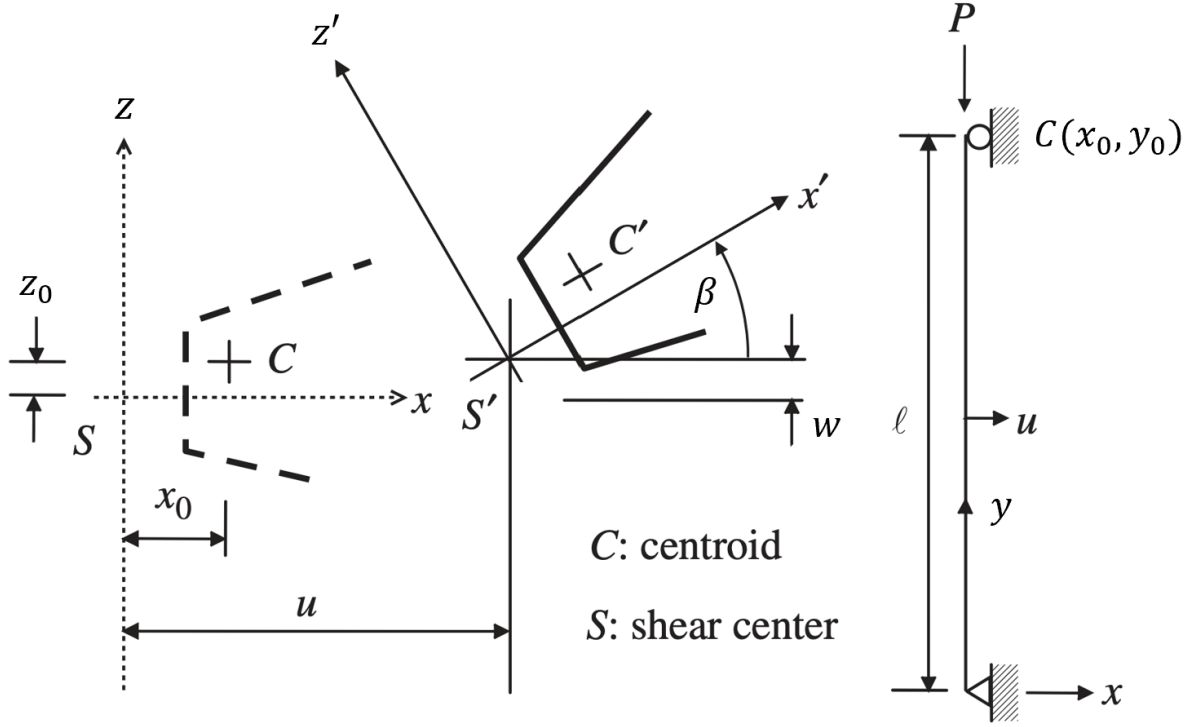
Representative figure of the flexural-torsional buckling deformation acting on the stiffeners, modeled as beam elements. Source: Adapted from (YOO; LEE, 2011).
